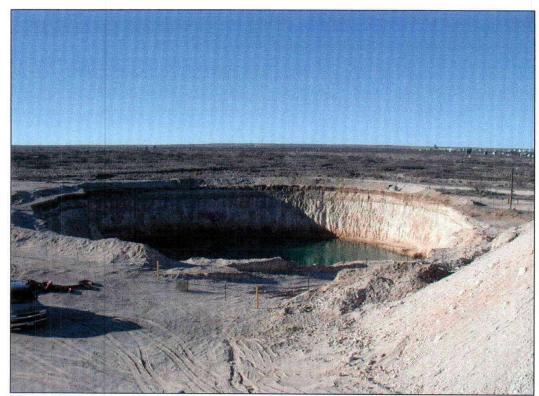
View looking at Excavation Area (2/28/01, photo by RJN)
